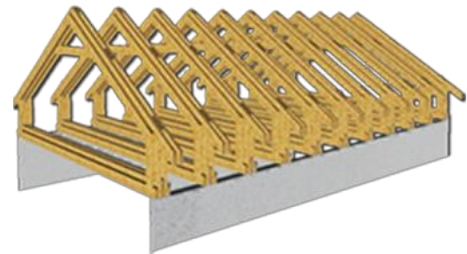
Attic truss from larger diameter framing lumber with reinforcing gussets at the corners (which would use products from the butt log) sitting on a load bearing wall. Image credit to CBS-Lifteam (cbs-cbt.com), a timber engineering and construction group from Switzerland and France that has pioneered the optimized use of lumber around the world.
